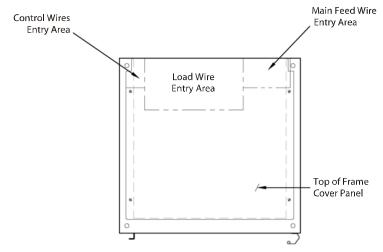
Recommended Conduit Cutouts (Top and Bottom of Rack)
